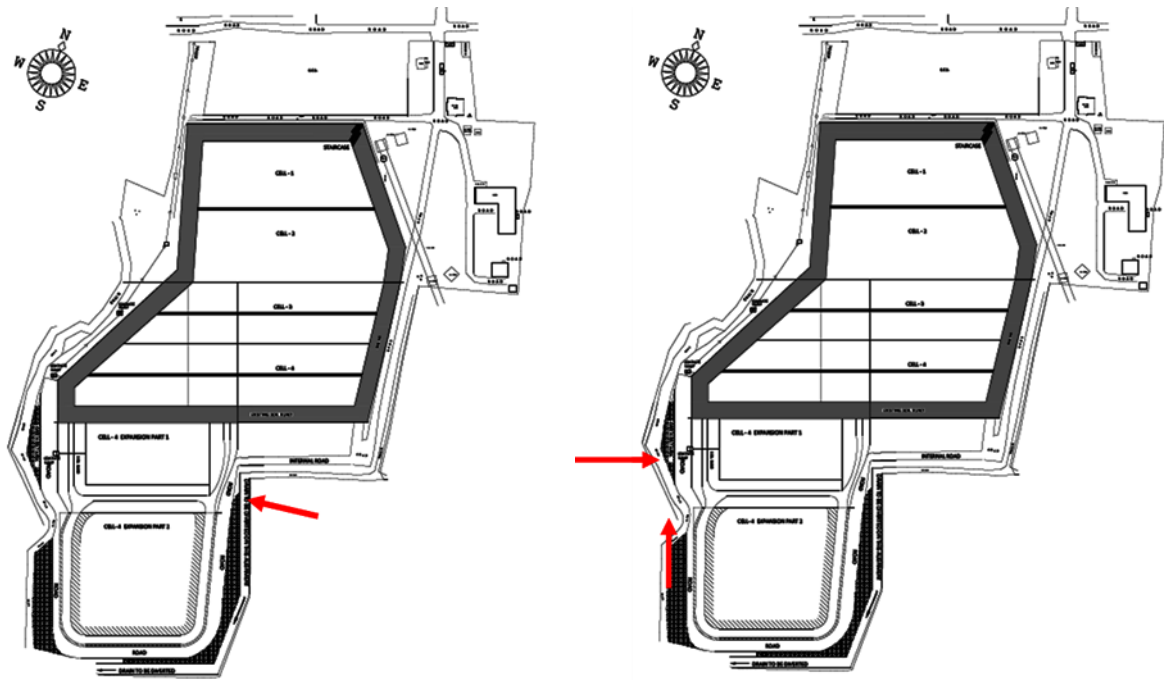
RS containment walls constructed on old embankments to the East and West of landfill
